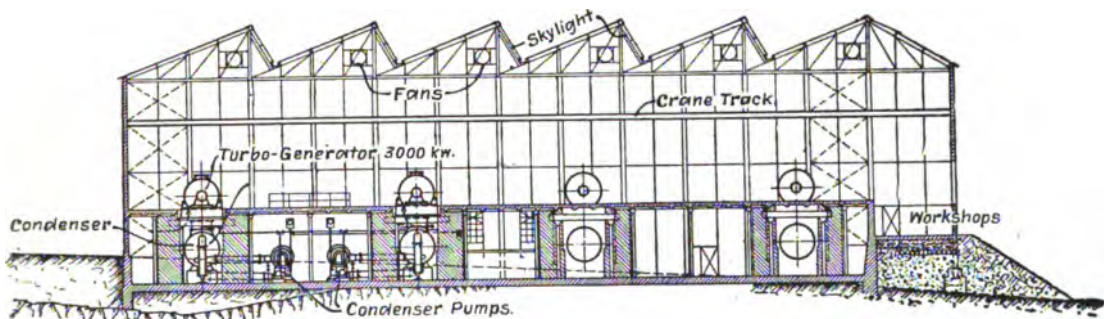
Simmerpan Power Station. Longitudinal Section through the Engine Room.
